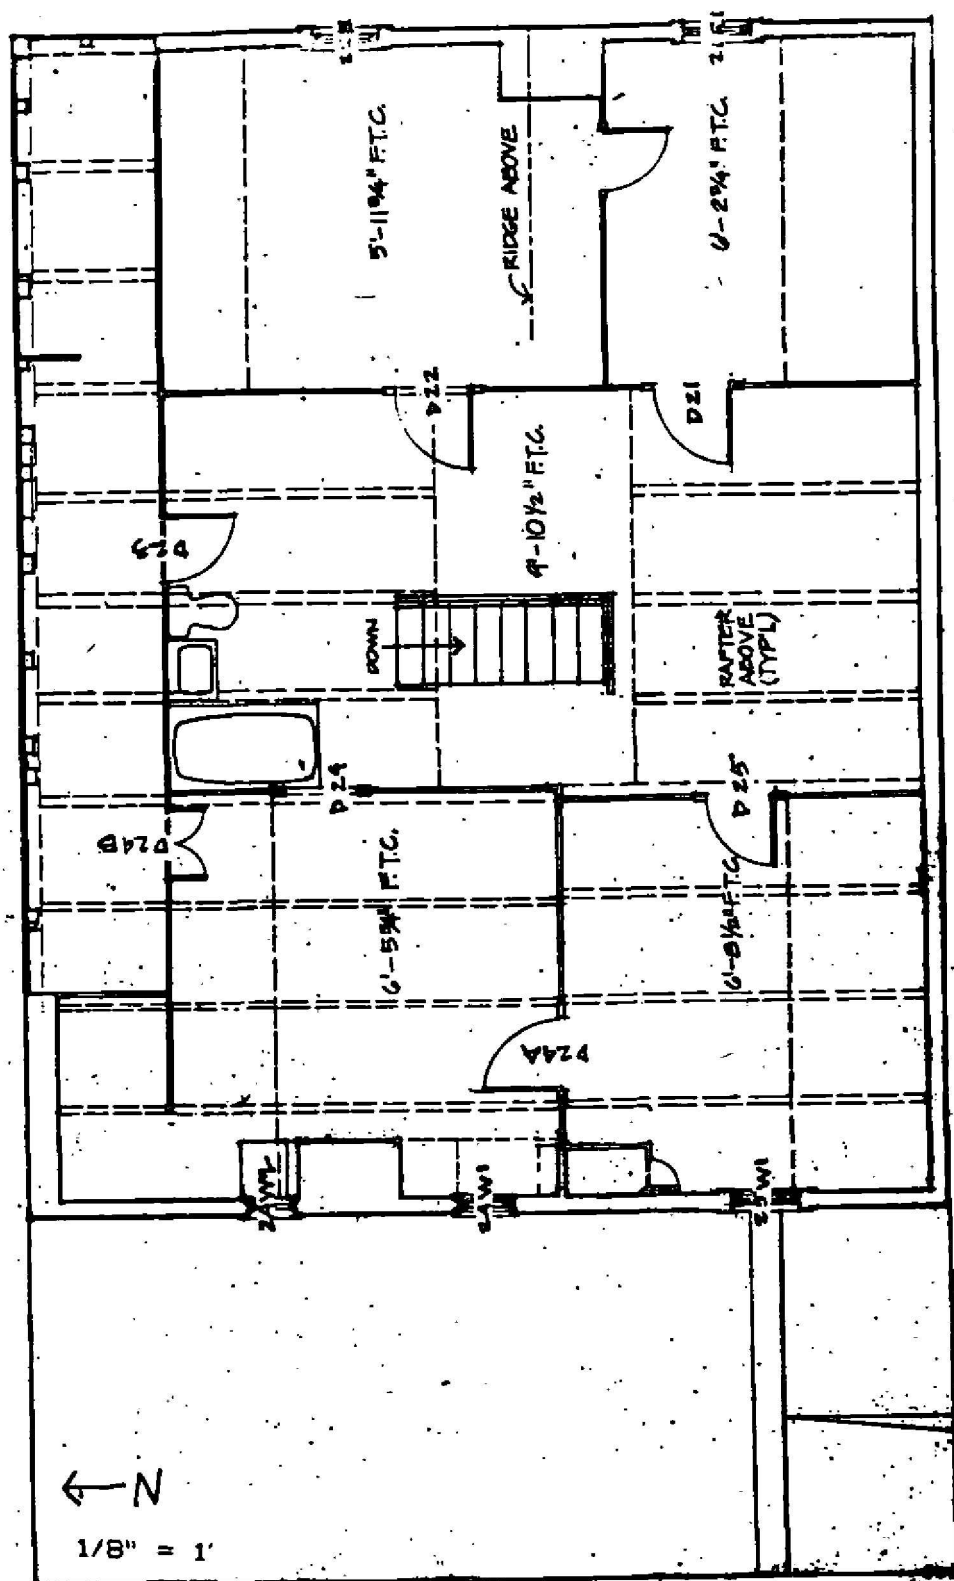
Contemporary plans and elevations of the Duryea house (1983).
